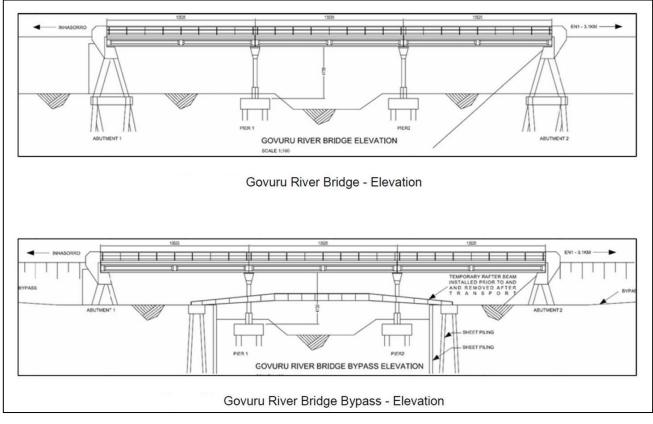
Cross section of existing Govuro River Bridge with temporary Bypass Bridge in foreground
